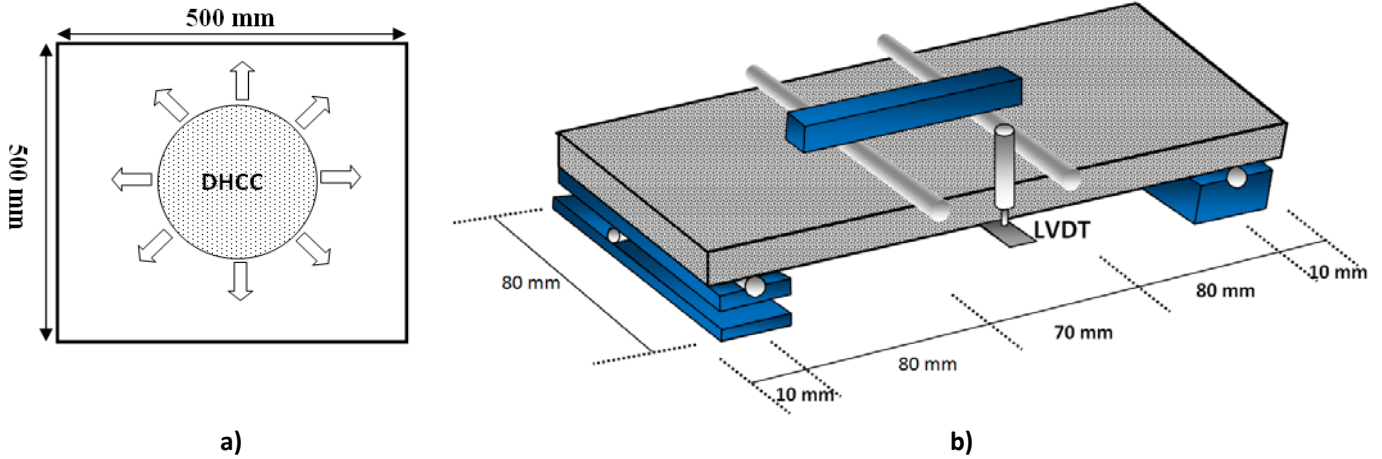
Casting DHCC panels; b) Flexural test setup (width of the specimen's cross section = 80 mm)
